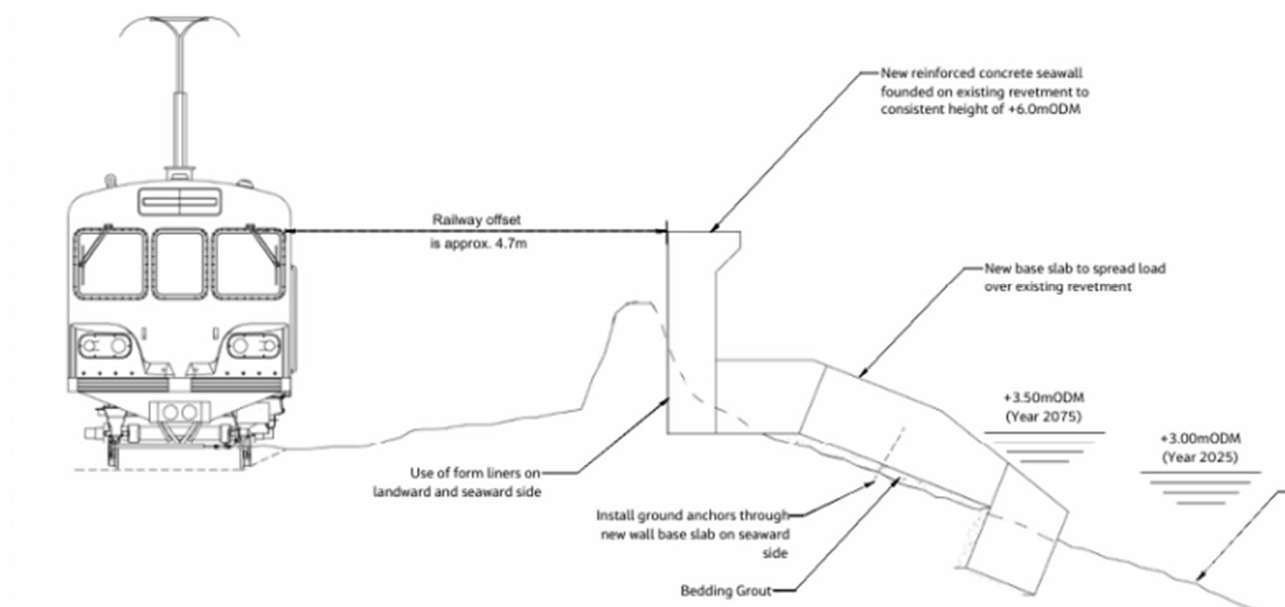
Typical section: Seaward wall on existing stone revetment base
